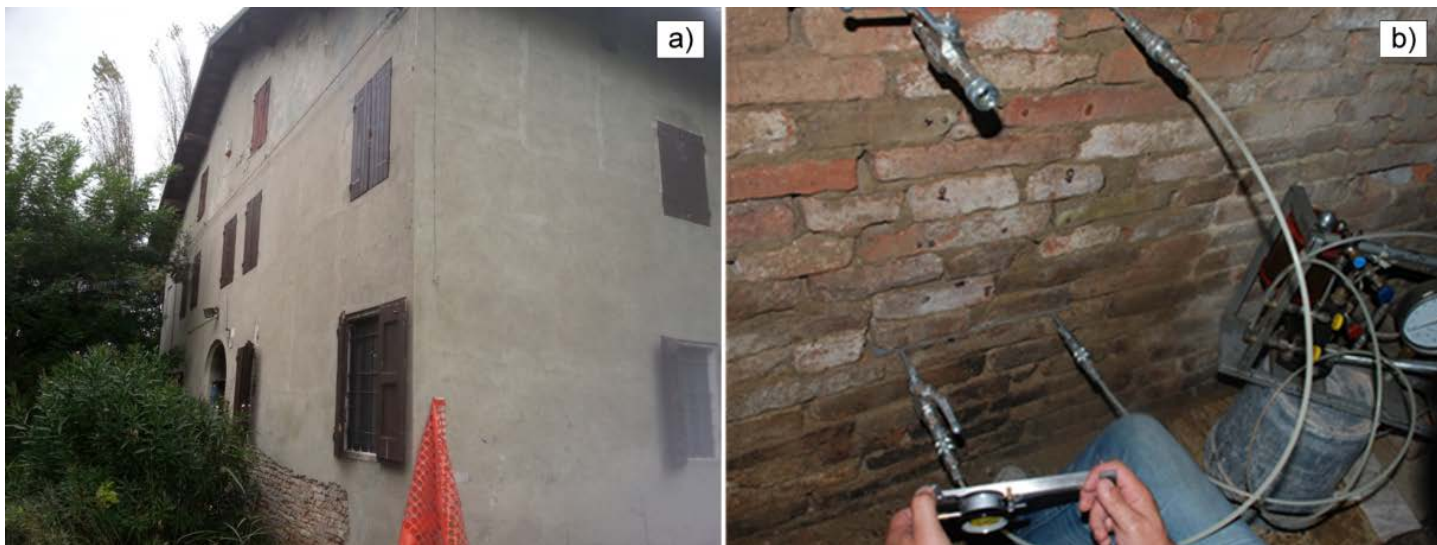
External view of Leona Building in Cento (Ferrara, Italy) (a) and double flat jack executed on an external wall (b).
